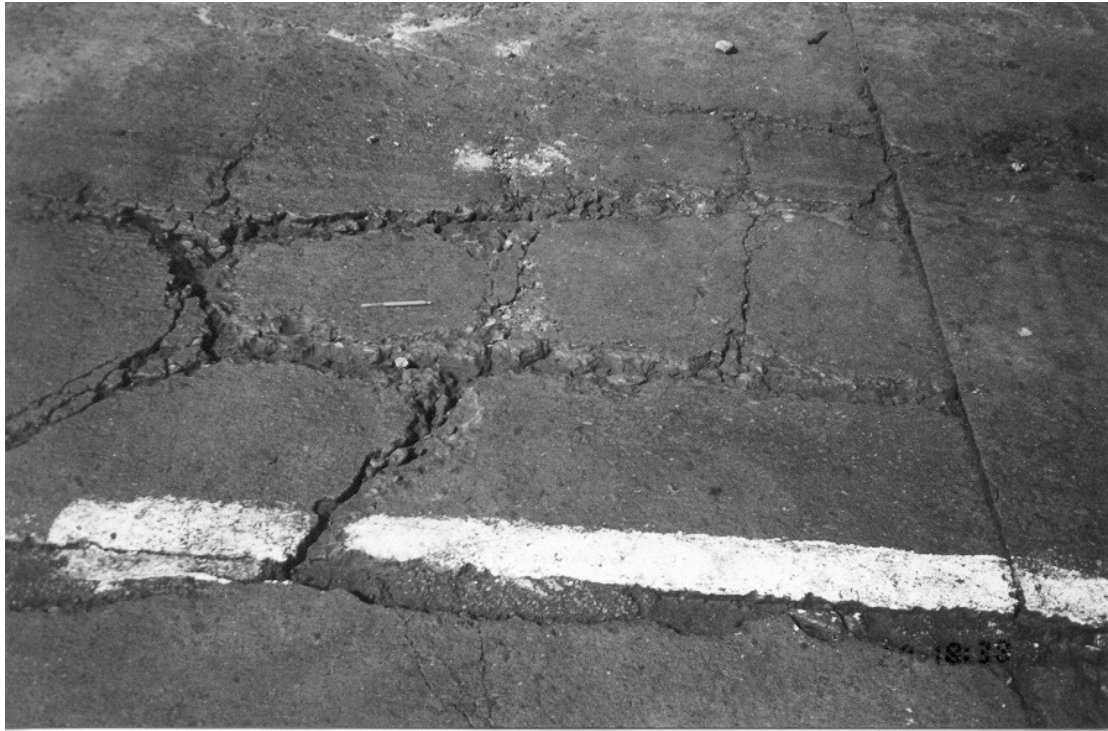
Example of cracks on existing container terminal concrete pavement.
